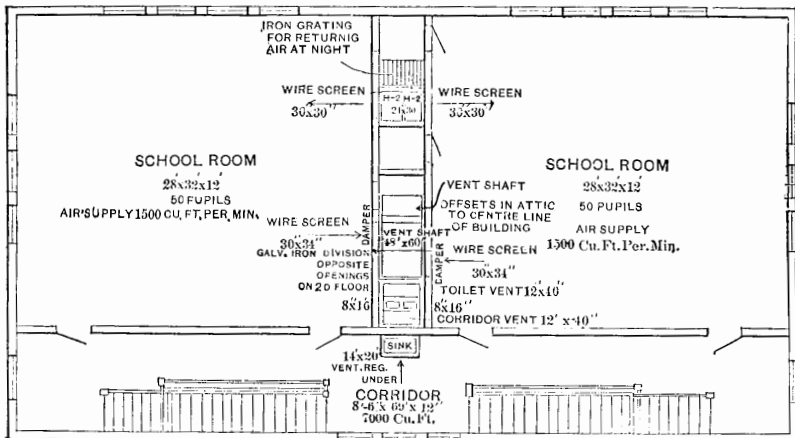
Second-Floor Plan (12' 0") of a School Building Heated by a Furnace System.
